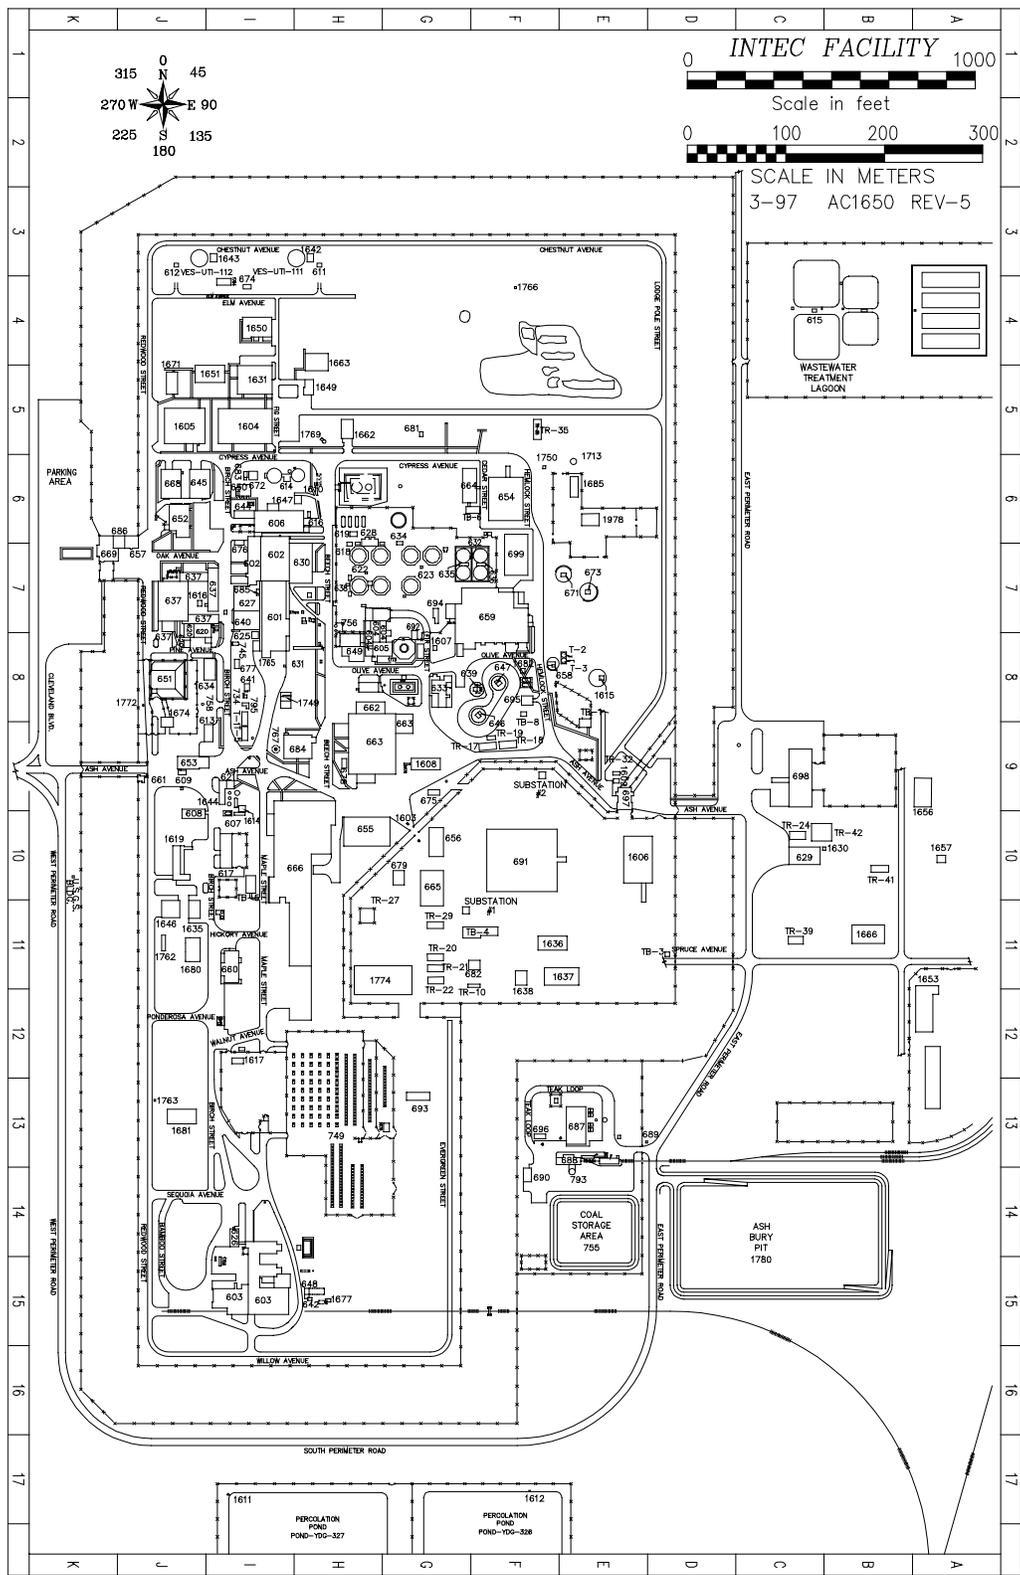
Plot plan view shows the layout and facility locations at INTEC.
